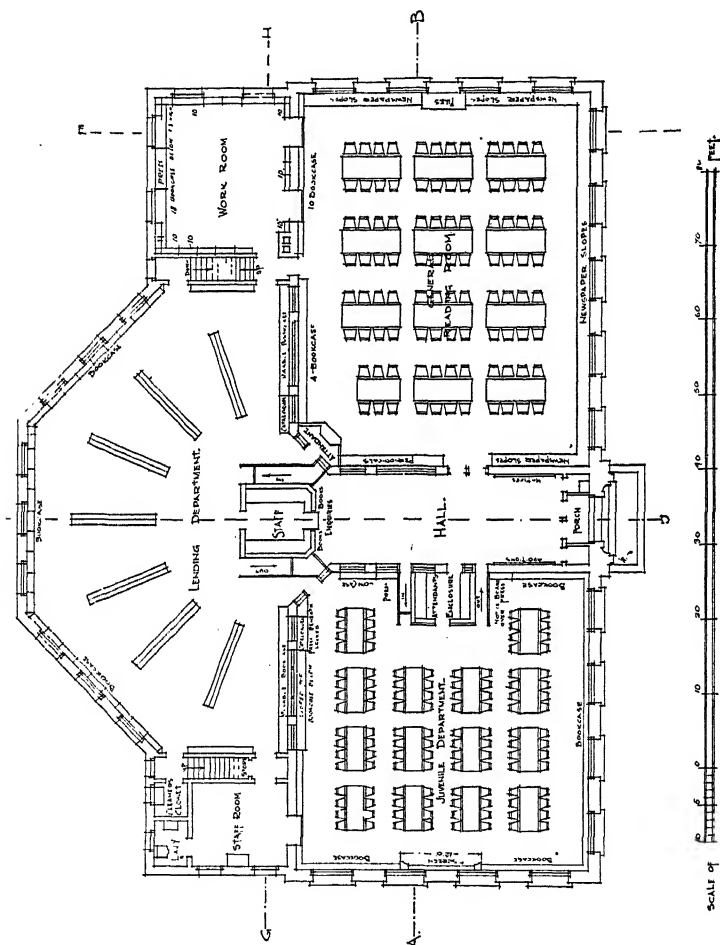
Shettleston and Tollcross Branch Library, Glasgow, Ground Floor Plan (Section 174).
